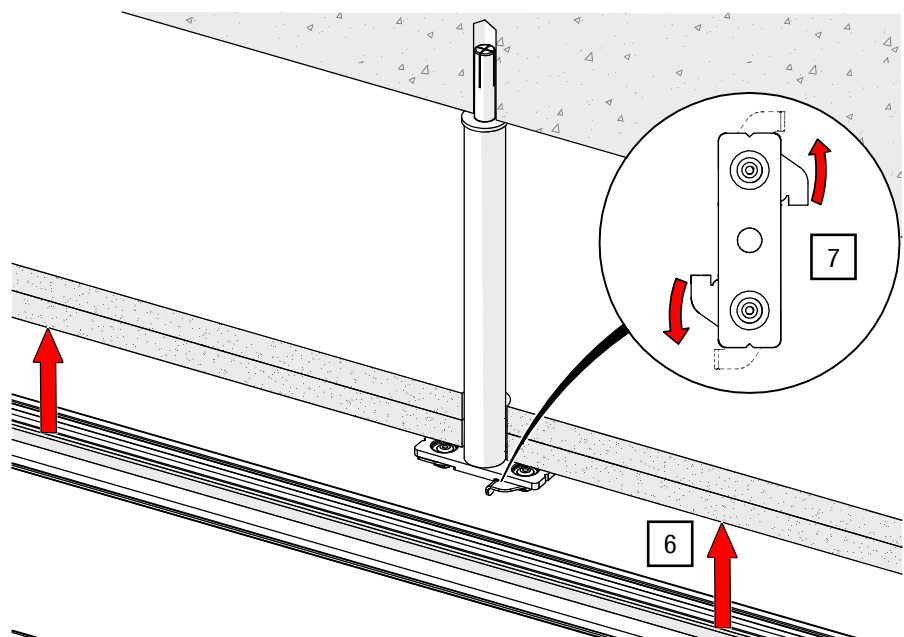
Ceiling suspension OFFICE – Lift track and lock ceiling mount bracket
